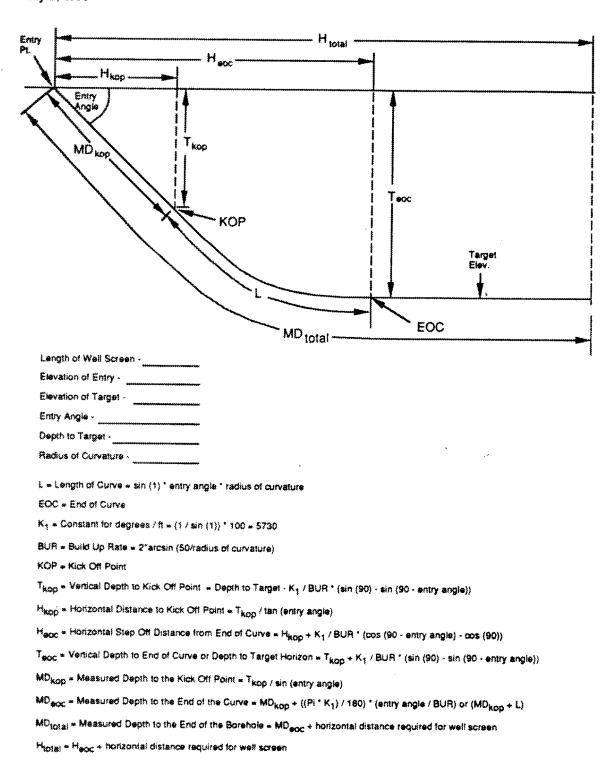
Diagram (in Cross Section) of Horizontal Well Layout
